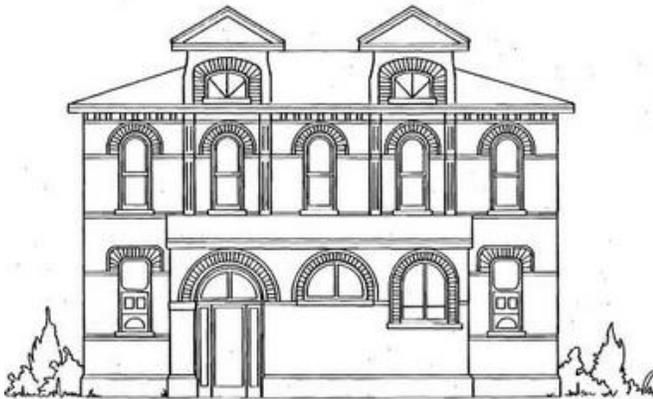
Drawing of the 1856 Central Public and Grammar School building's front façade (Brampton Heritage Board, 1983)
